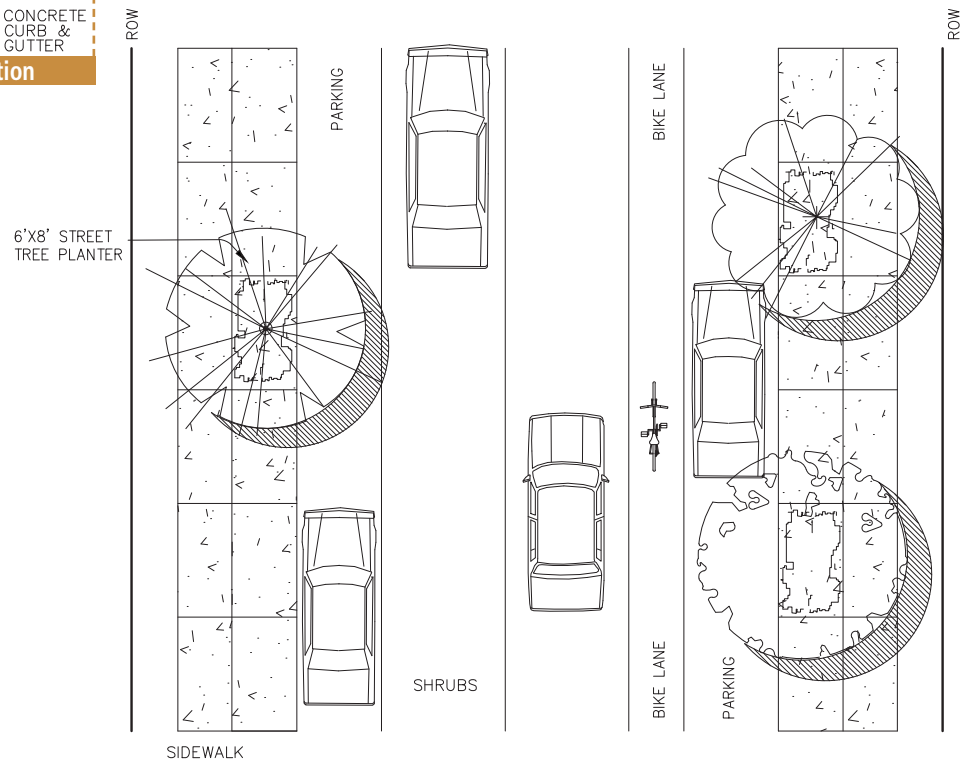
Eastbound Main Street (TM Street Section 3)
